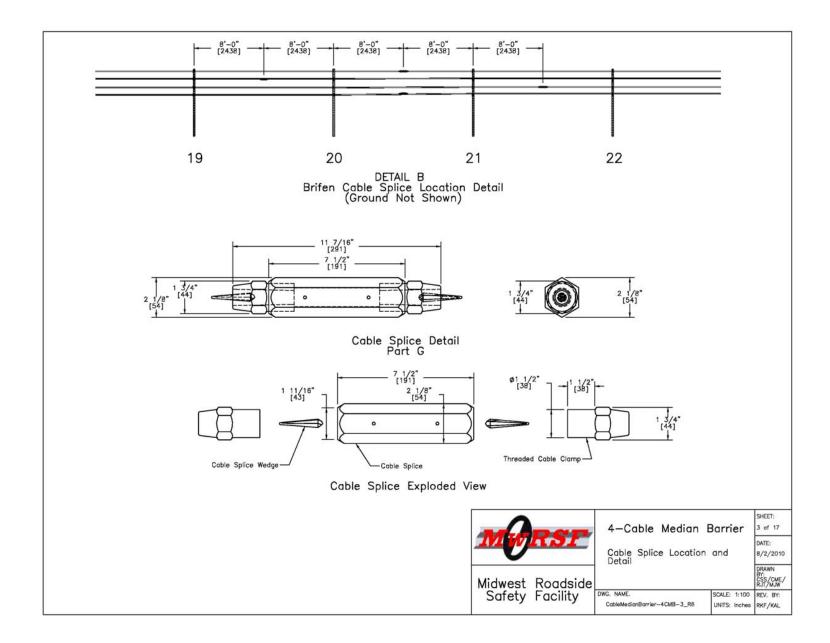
Cable Splice Location and Detail, Test No. 4CMB-3
